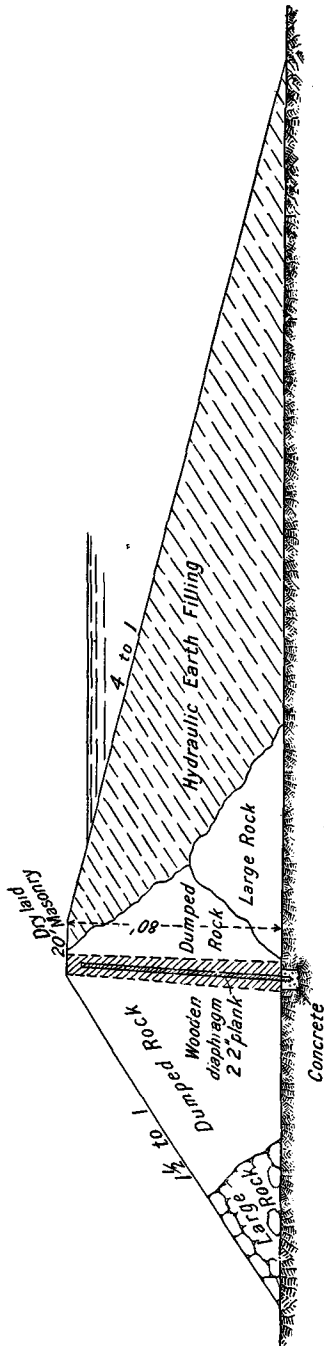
Milner Dam, Twin Falls Canal, Idaho.
